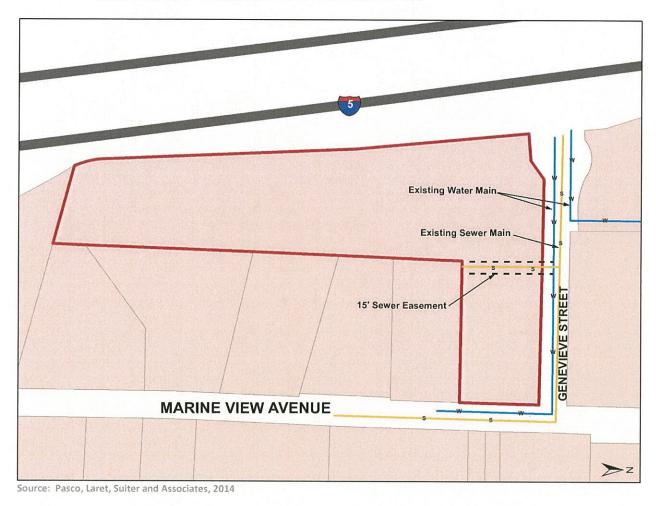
Water and Sewer Existing Facilities Map
